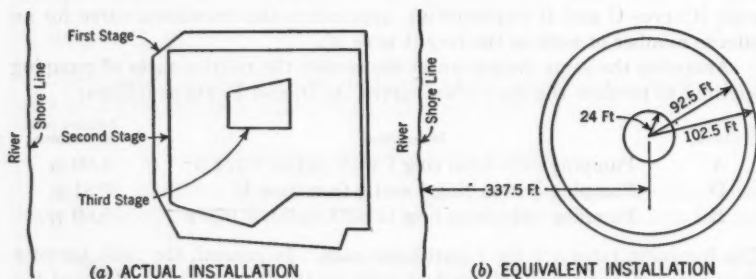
WELLPOINT INSTALLATION ADJACENT TO RIVER
